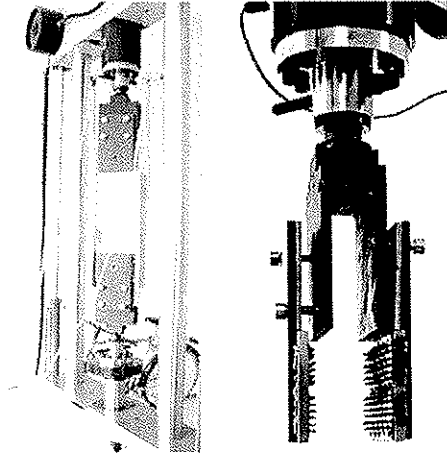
Specimen fixed in servo hydraulic testing machine Amsler HA 100 and detail of toothed metal plate
